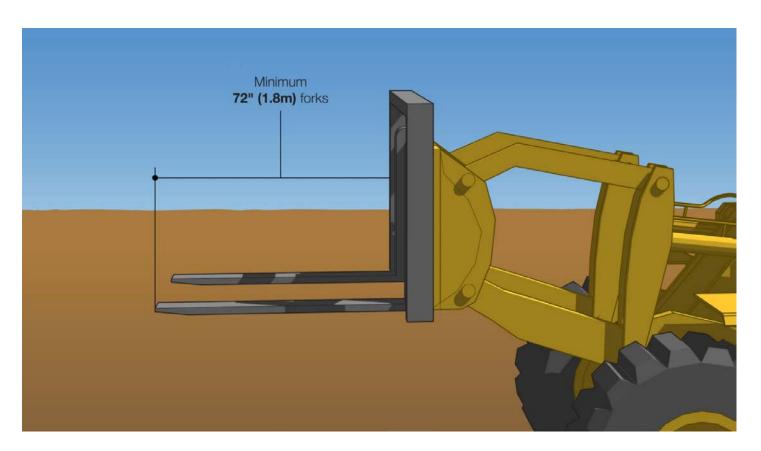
Minimum 72" (1.8 m) Forks for Unloading Chamber Pallets
